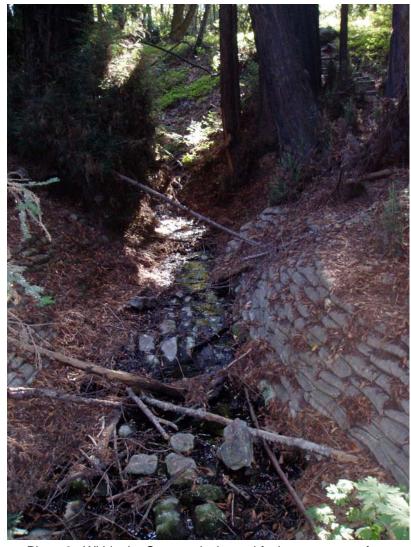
Within the State park channel facing upstream of a culvert. Channel has channel hardened and will create increased energy due to lack of structure and constraints.
